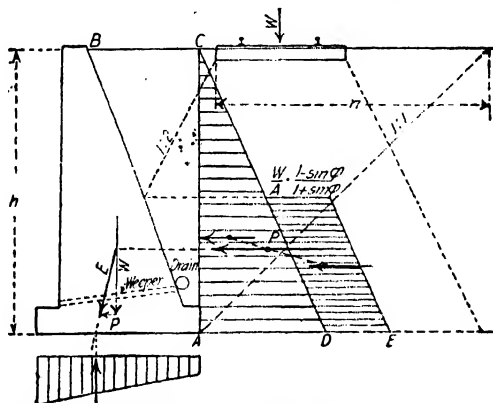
Pressure on a retaining wall due to loaded fill.
